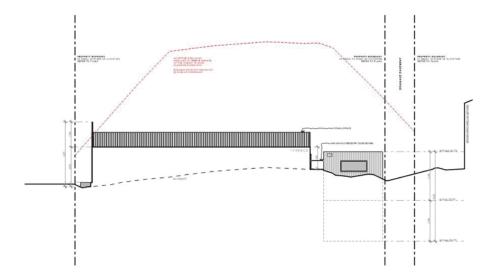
Rear (west) elevation, showing retaining structure and ground level at rear of studio (Crump Architecture, 2022)
